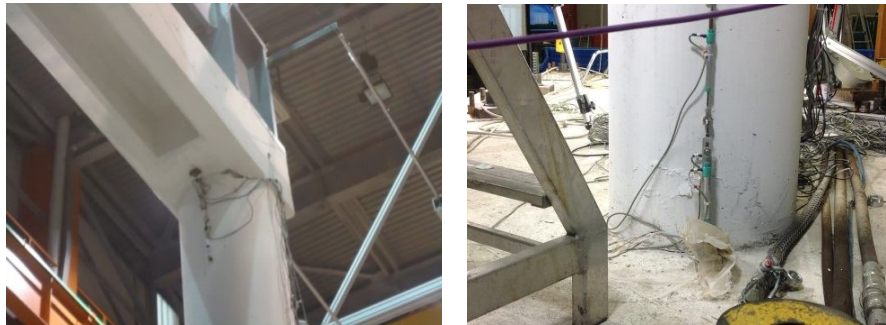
Crack opening at the top and bottom of pier 11 after test k09
